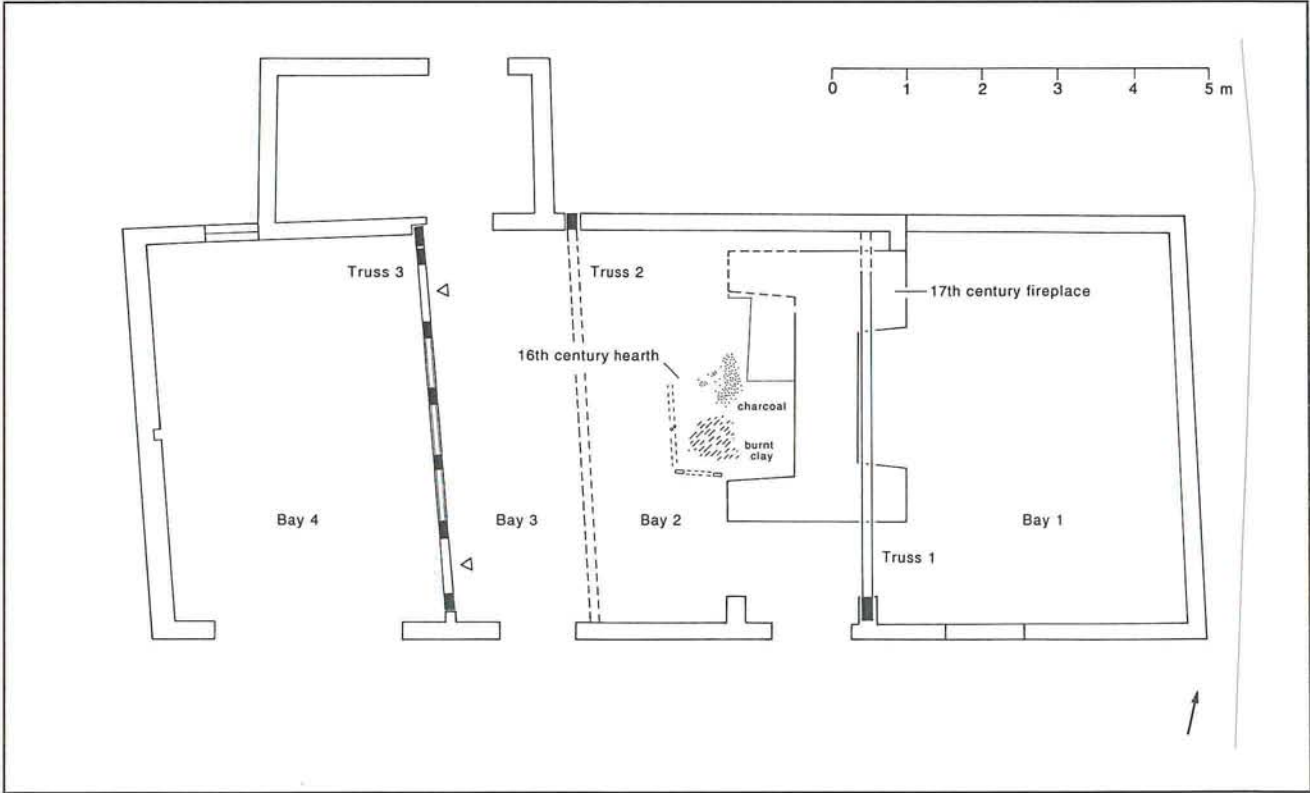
Plan of the Old Farmhouse showing the main elements of the timber framing and the location of the early hearth. Scale 1:100
